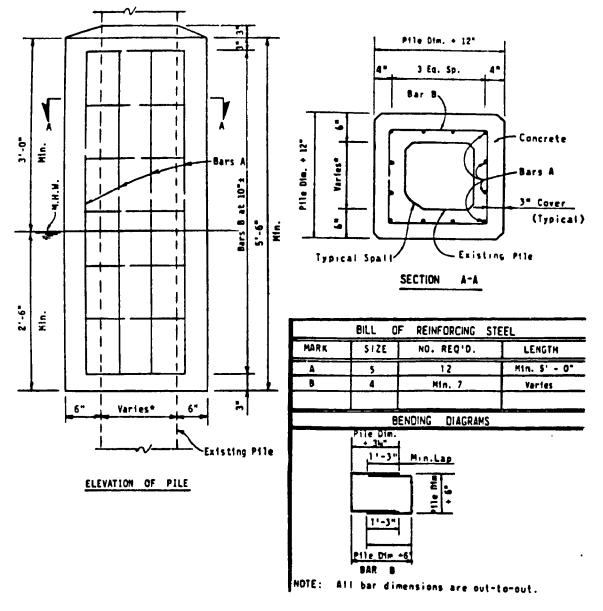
CONCRETE PILE JACKET (FLORIDA STATE DEPARTMENT OF TRANSPORTATION)<sup>2</sup>
